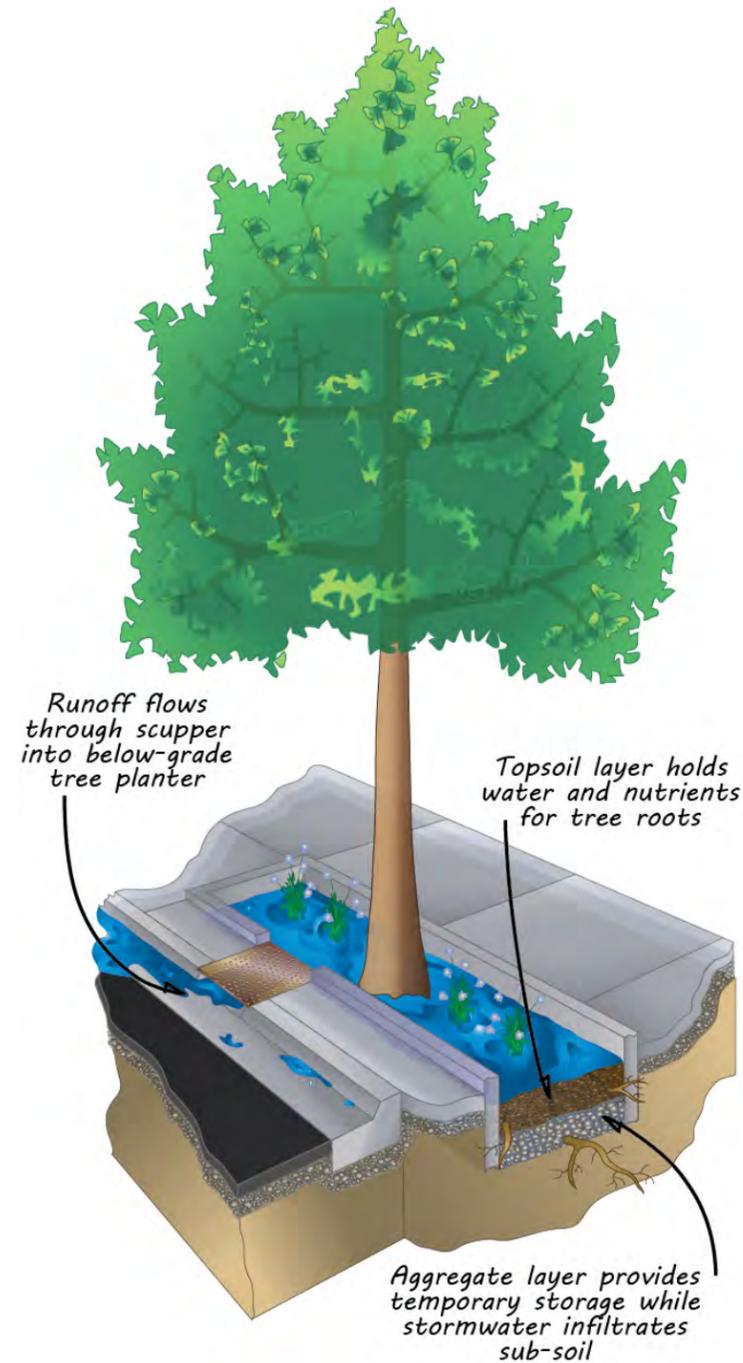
Stormwater tree pits are designed to collect runoff from streets, parking lots, and other impervious areas. Stormwater is directed into scuppers that flow into below-grade planters that then allow stormwater to infiltrate soils to supplement irrigation.
